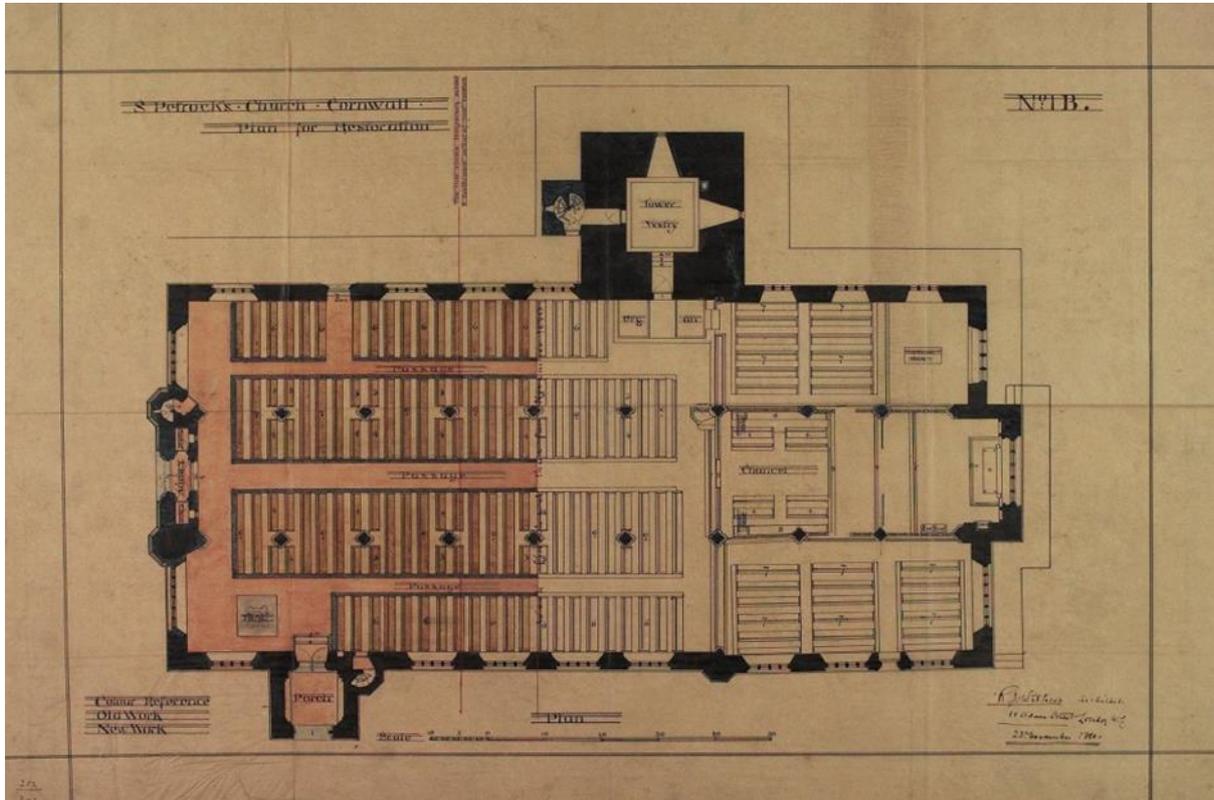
Robert Withers 'Plan for Restoration' as lodged with the Incorporated Church Building Society 1880.
